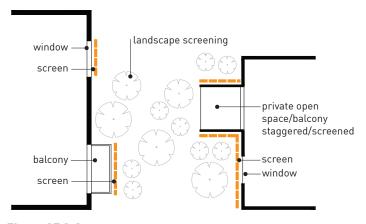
F.8-2: Windows, balconies, private open space must be screened or staggered to avoid overlooking.
